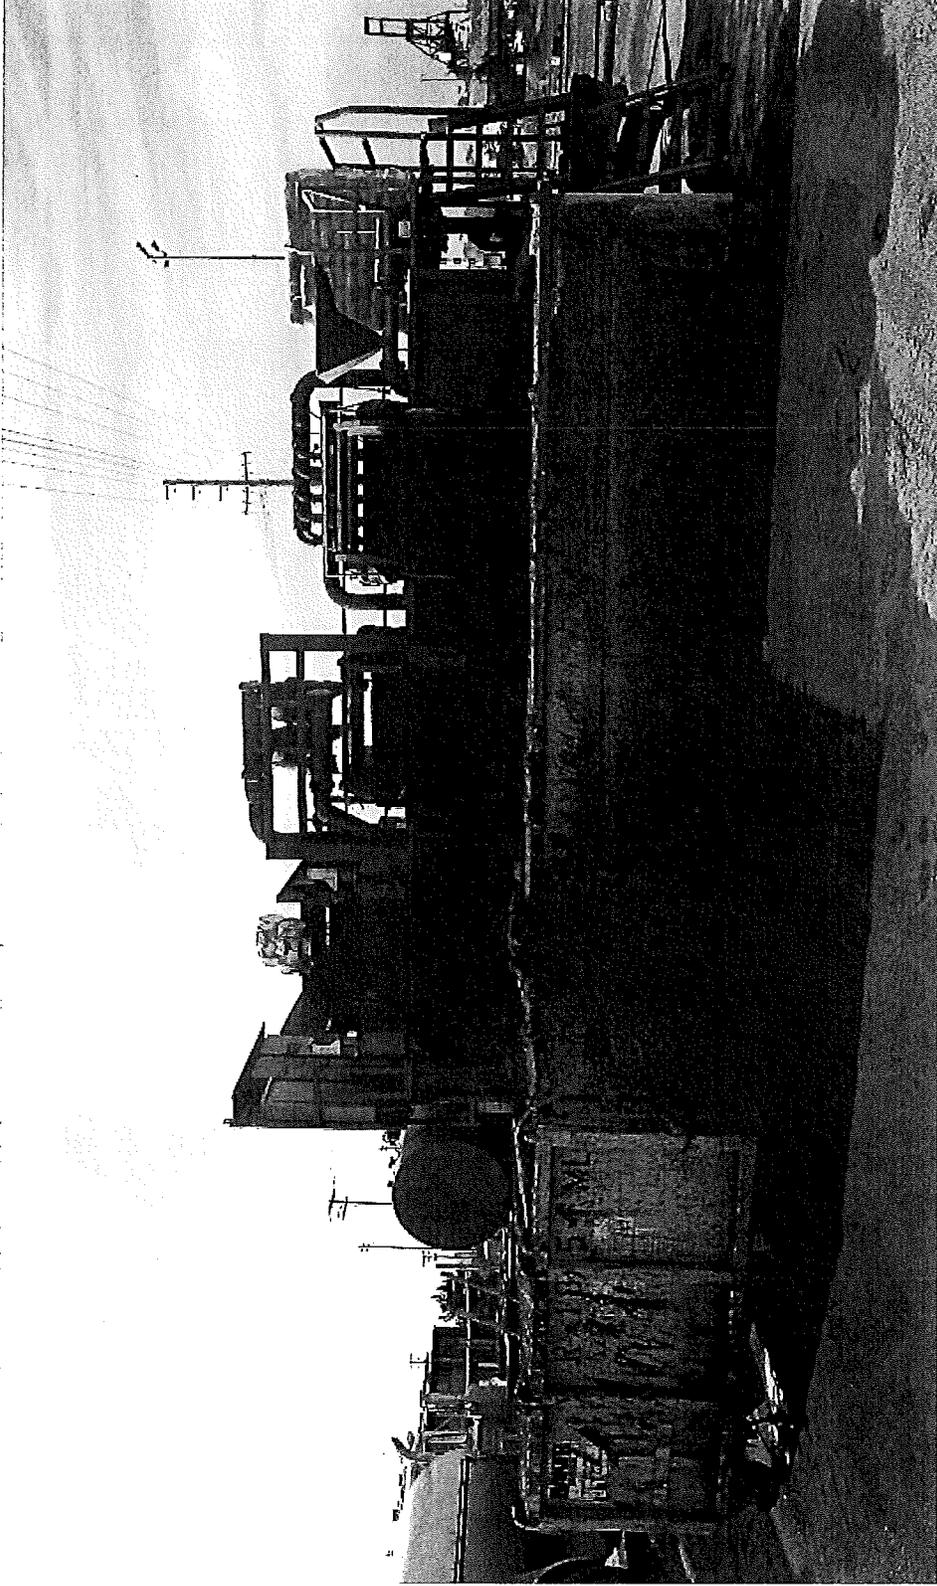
Separation plant for HDD drilling fluid. Rock fragments are separated from bentonite slurry before the slurry is recycled through the drill rig.
